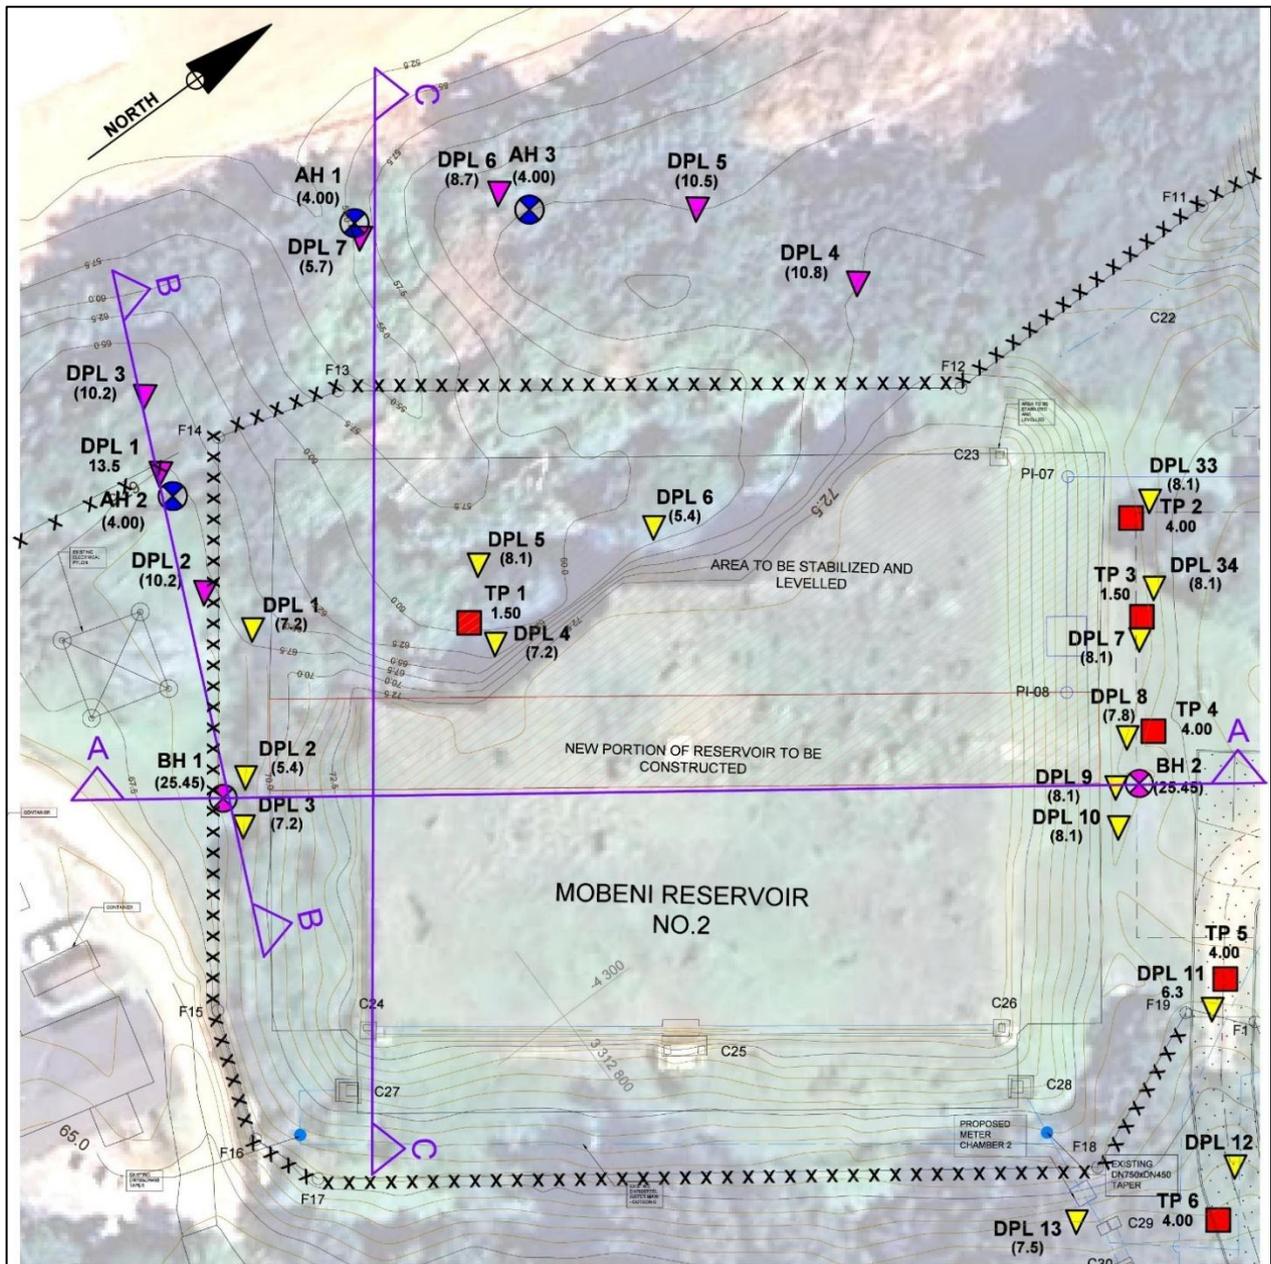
Site Plan showing site layout and Geotechnical Tests carried out
